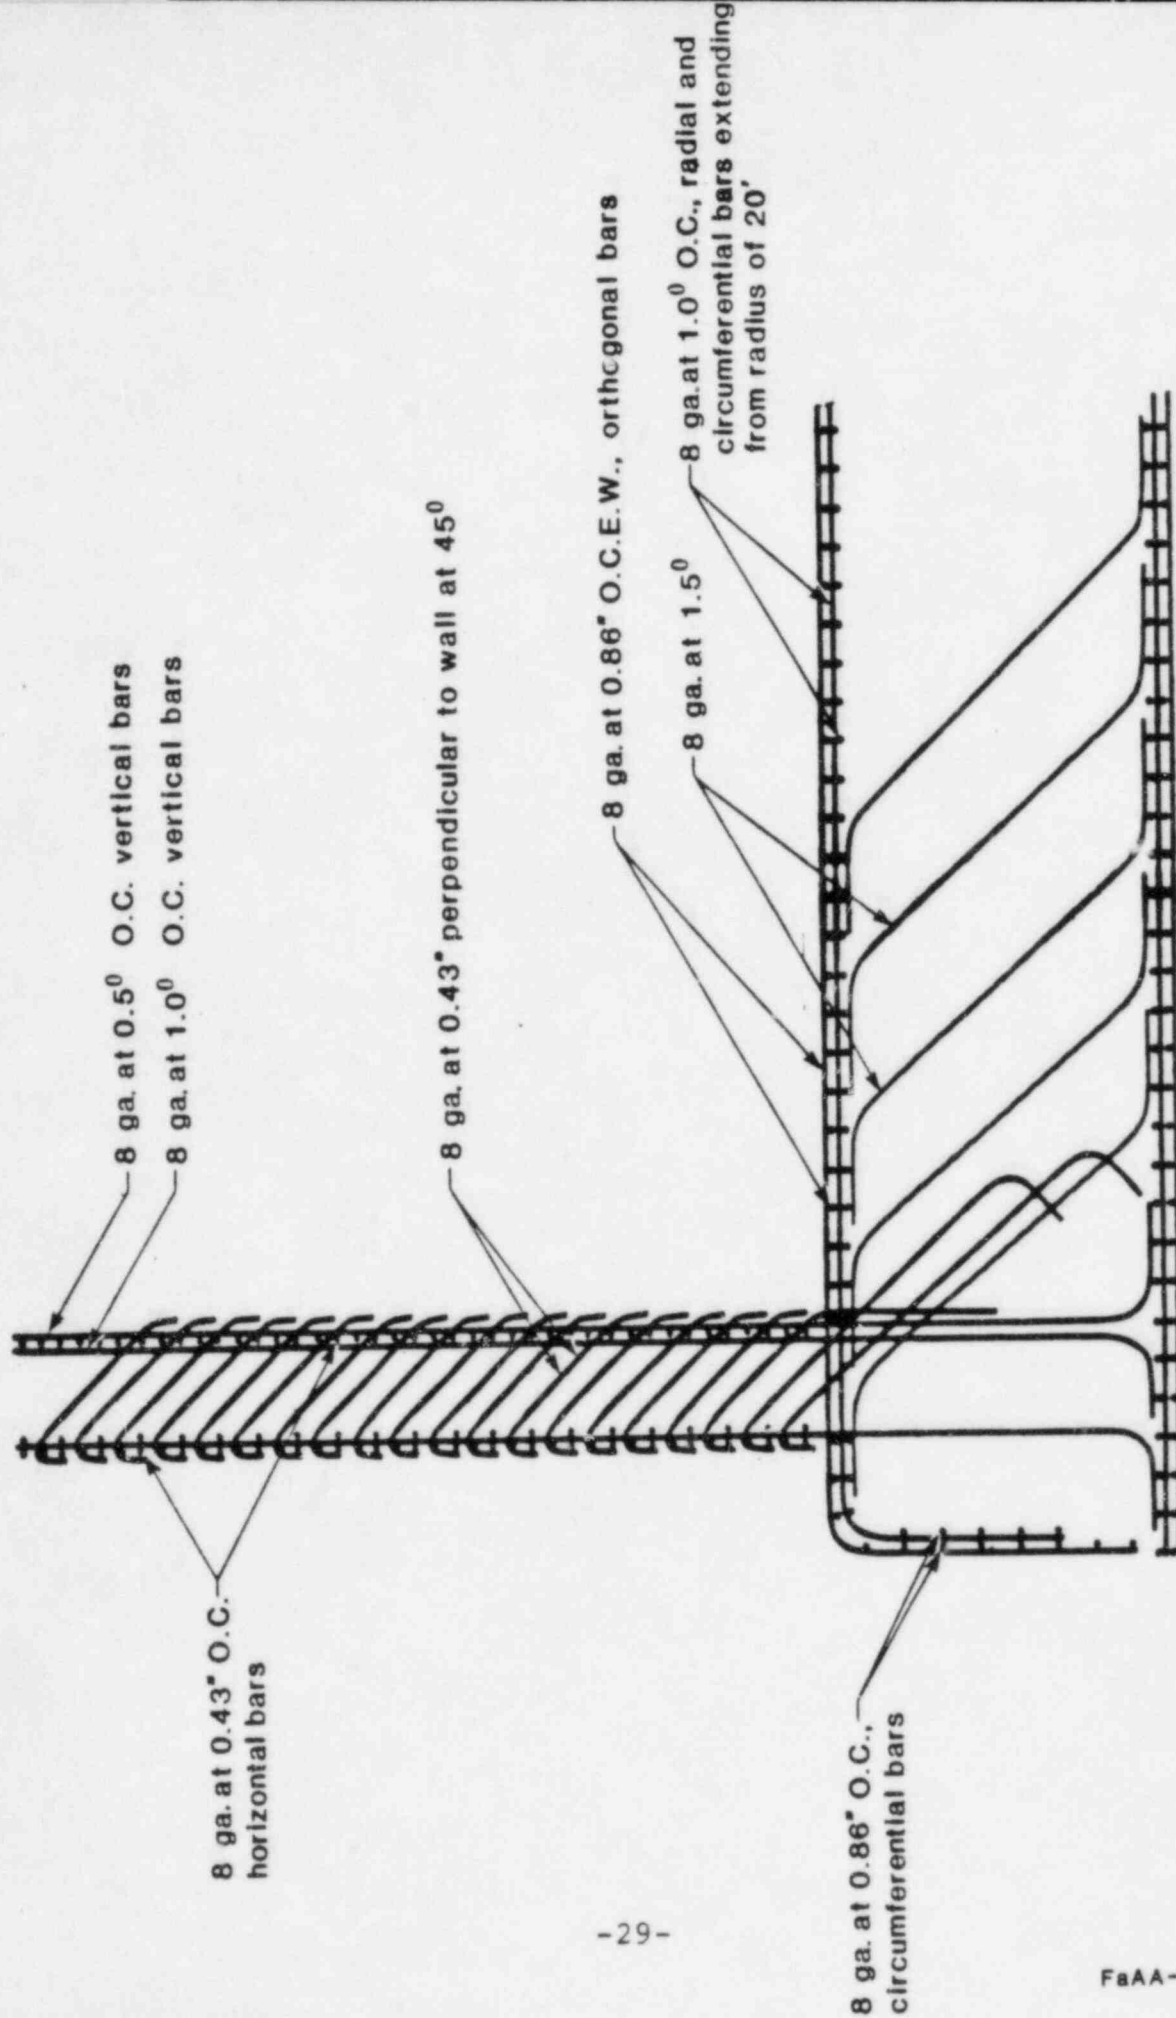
Typical model reinforcement detail at the connection of base slab and cylinder.
